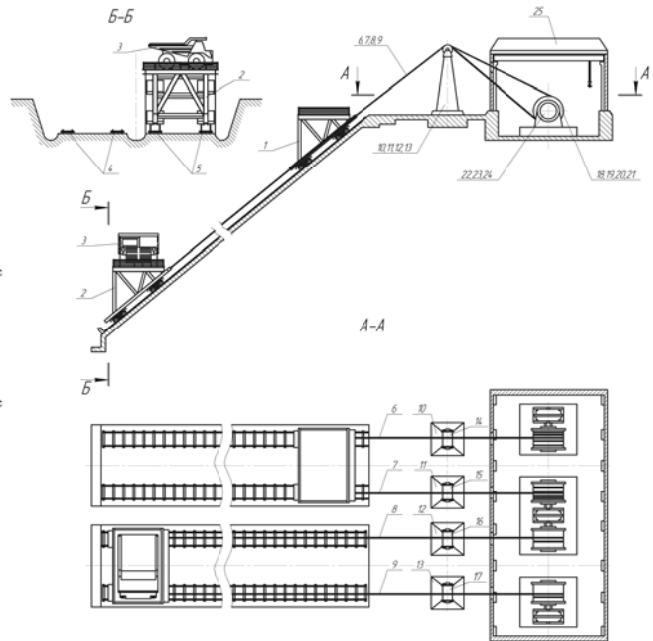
General view of a hoisting plant with a single-sided arrangement of two parallel tracks in a plane of a pit wall
